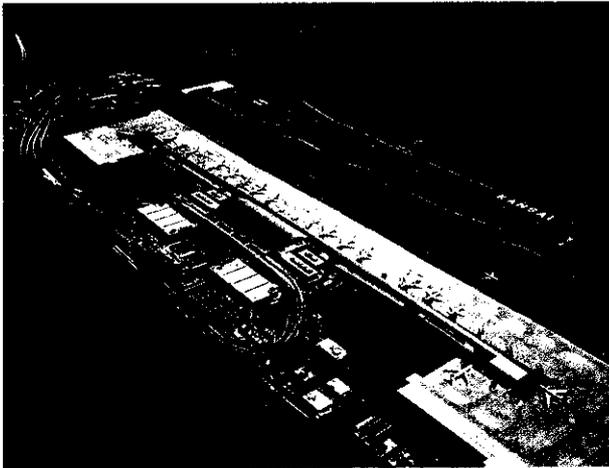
An aerial view of the passenger terminal building at Kansai International Airport: R30-2 panels of 1.0 and 1.5 mm thick cover the entire 90 000 m² roof of the building
